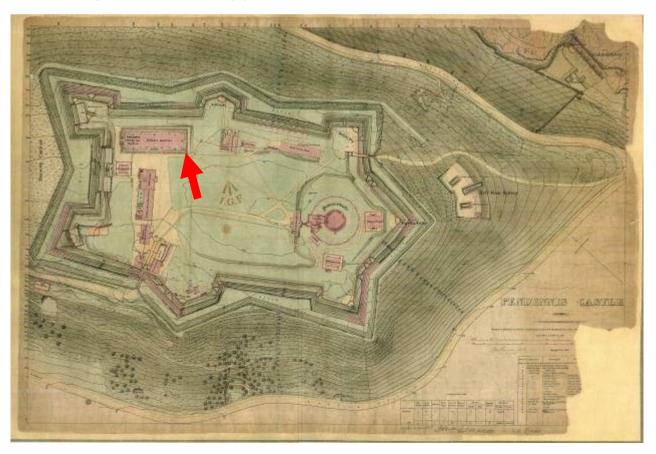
Plan of Pendennis Castle. 1868 (PRO 2757). Red arrow shows wall possibly encountered in Trench 3.
